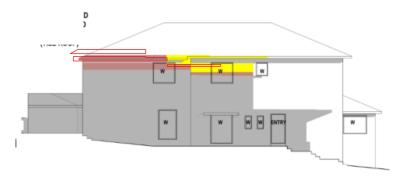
Proposed shadow impact to No. 59 Reina Street at 3pm on 21 June (additional shadowing outlined in red, sunlight shown in yellow)
